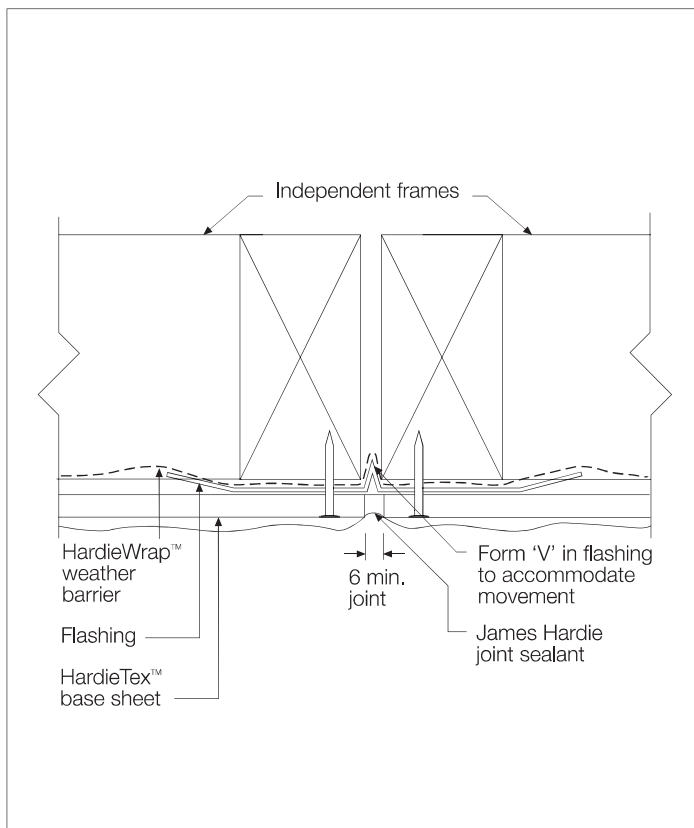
VERTICAL MOVEMENT JOINT IN HARDIETEX WALL
